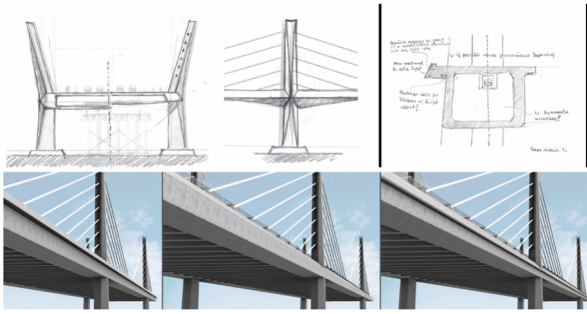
Hand sketches and renders of different tower and deck and parapet options
